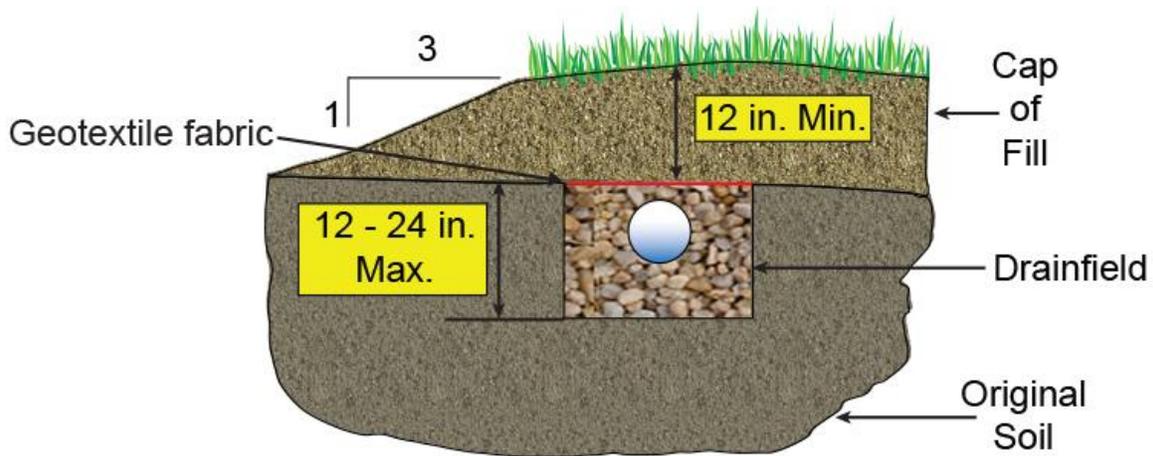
Cross-sectional view of a below-grade capping fill trench.
